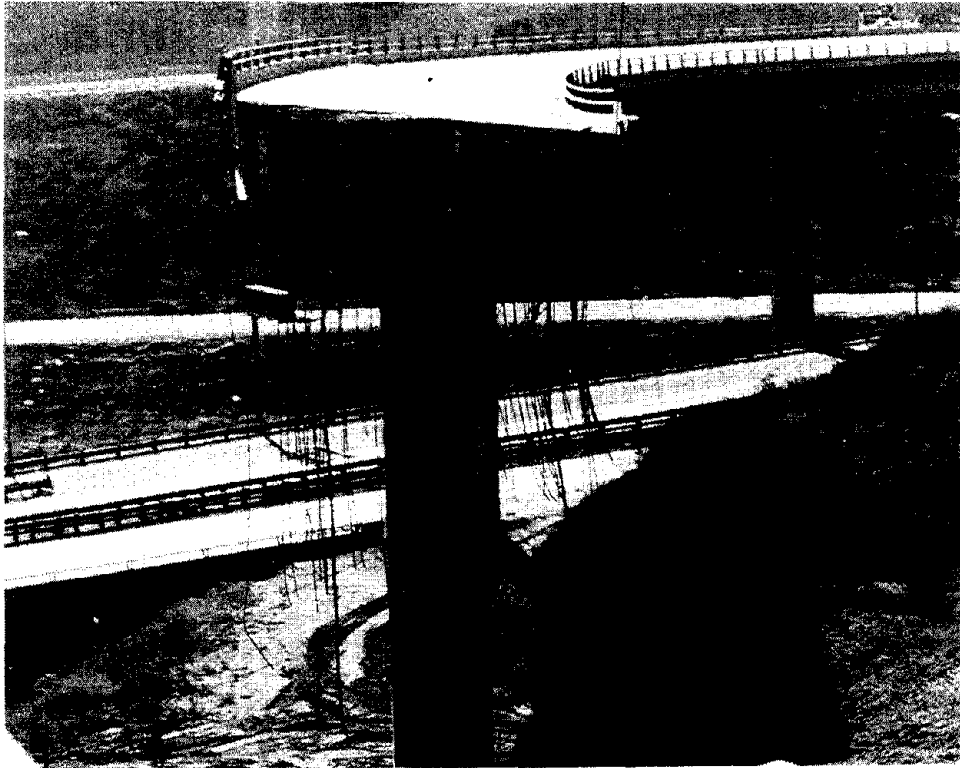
View of the flexural failure at Pier 3 of the SR14/I5 North Connector Overcrossing, looking to the south
